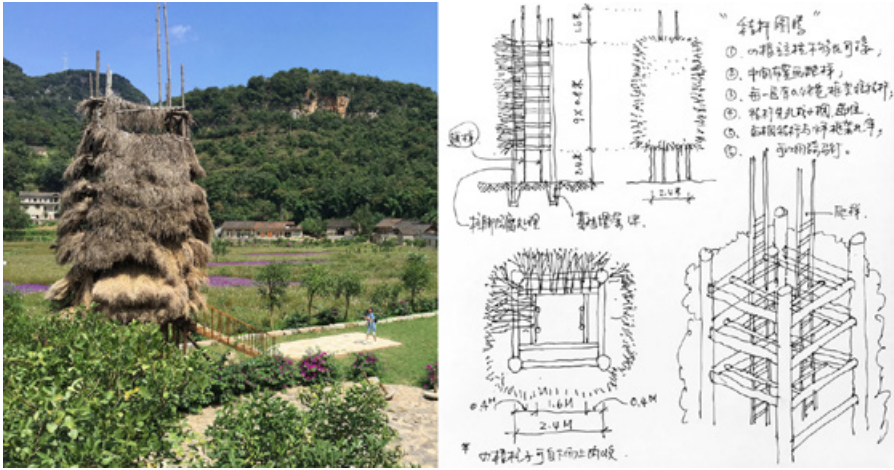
Professor Lyu designed an installation that drew inspiration from the traditional treatment of crops straw stalks in Yubulu village. (Source: photo on the left was shot by the author, the hand drawing on the right was sketched by Lyu Pinjing)
